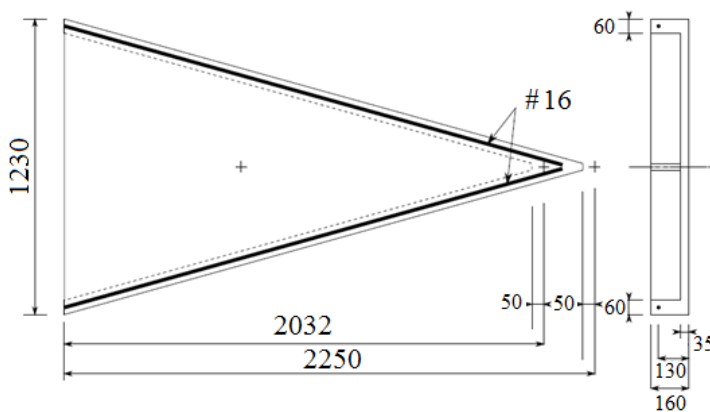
Top view of specimens (Left side) and cross-section (Right side) – Dimensions in mm
